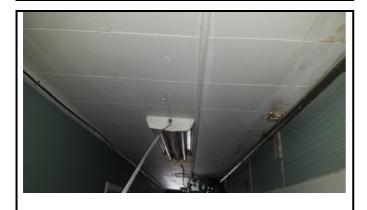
HA30 Concrete w/Sprayed Ceiling Texture
